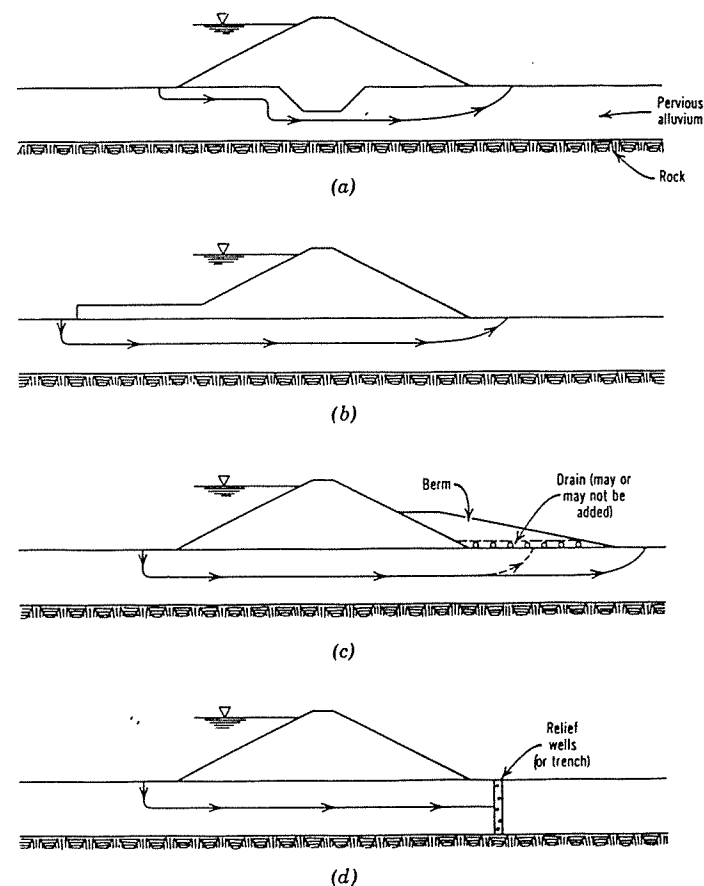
1 Methods of underseepage control for dams on pervious foundations without complete seepage cutoffs. (a) Partial vertical cutoff. (b) Upstream impervious blanket. (c) Downstream berm. (d) Relief wells.
